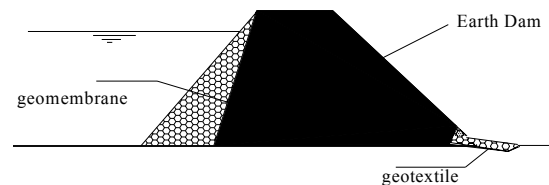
f Geosynthetic use for Earth, earth-rock, and Roller compacted concrete dam waterproofing
